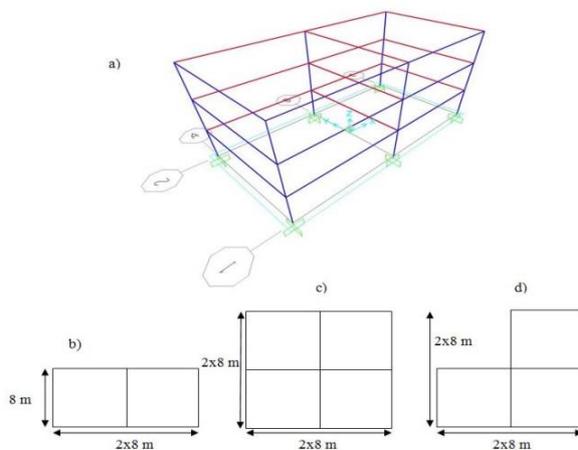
a) Base rectangular model with  $x$   $y$  and  $z$  coordinates b) plan view of rectangle c) plan view of the square model d) plan view of the L-shaped.
